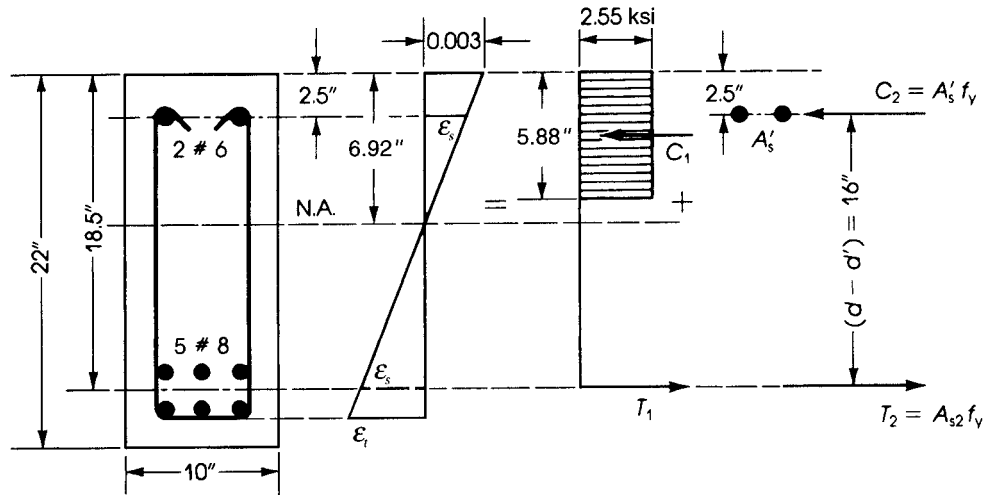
Example 4.5: doubly reinforced concrete section.
